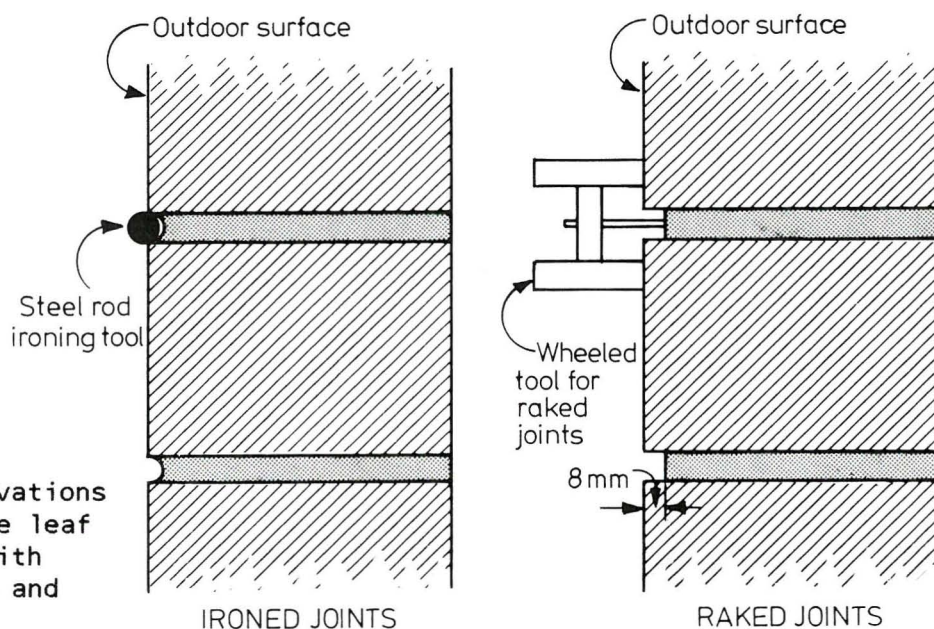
Sectional elevations through single leaf brick walls with ironed joints and raked joints.
